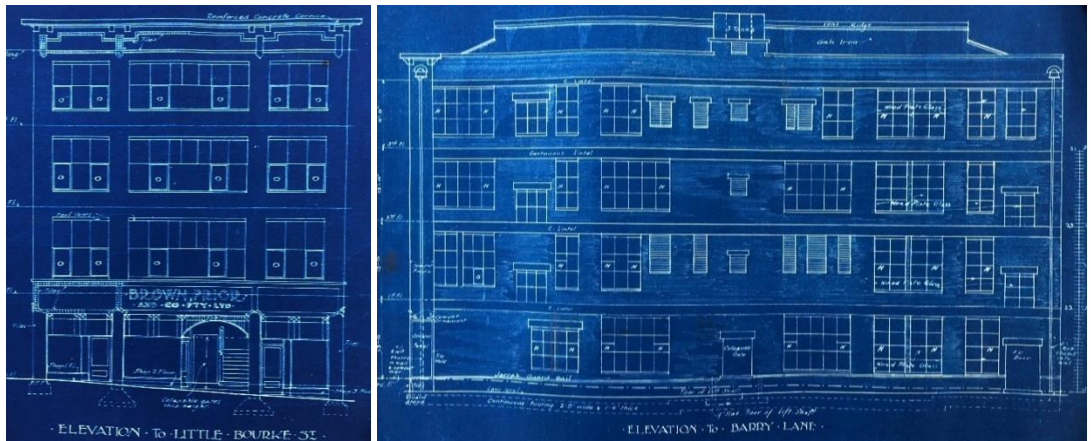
Front and side elevations of the subject building from architect plans 1923 (Source: PROV VPRS 11200/1, unit 587)
